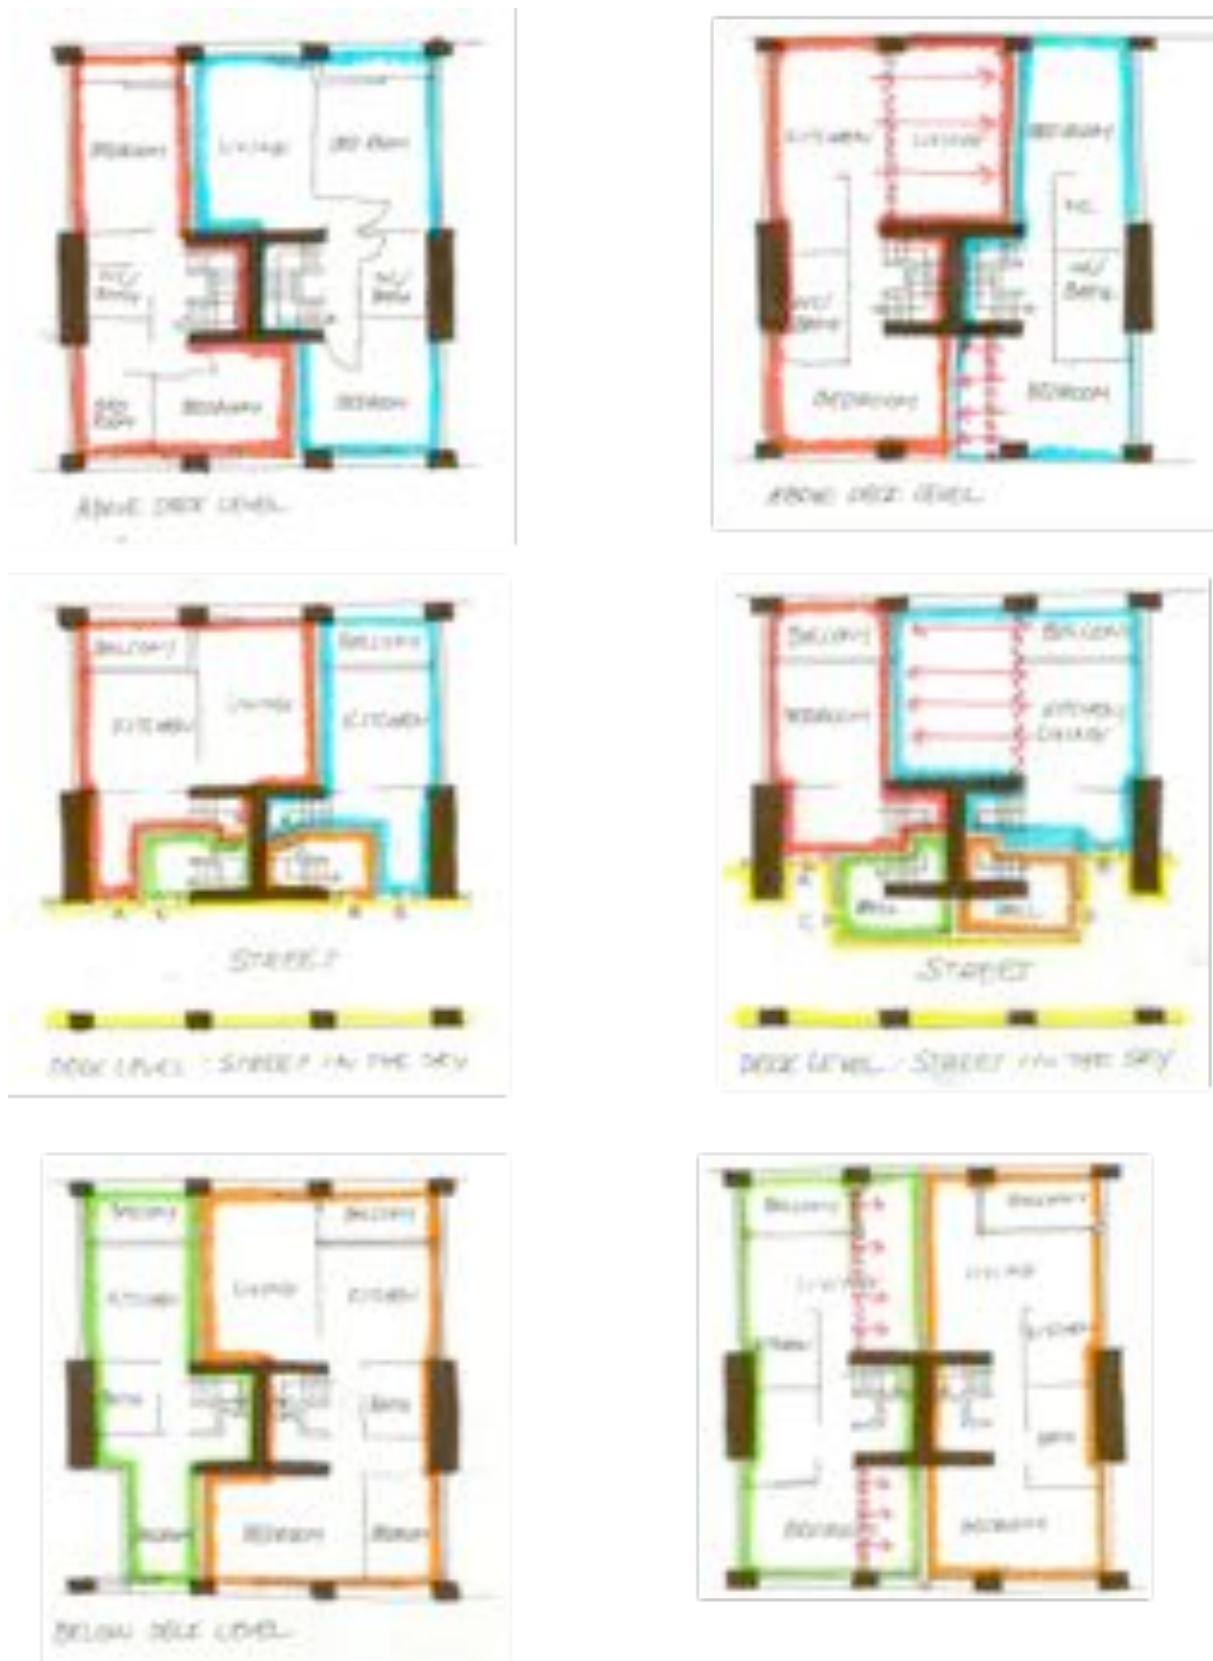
Internal changes in the flats' arrangements, redrawn from original plans and marketing material plans by Urban splash. Redrawn from original plans (AR, 1961)
